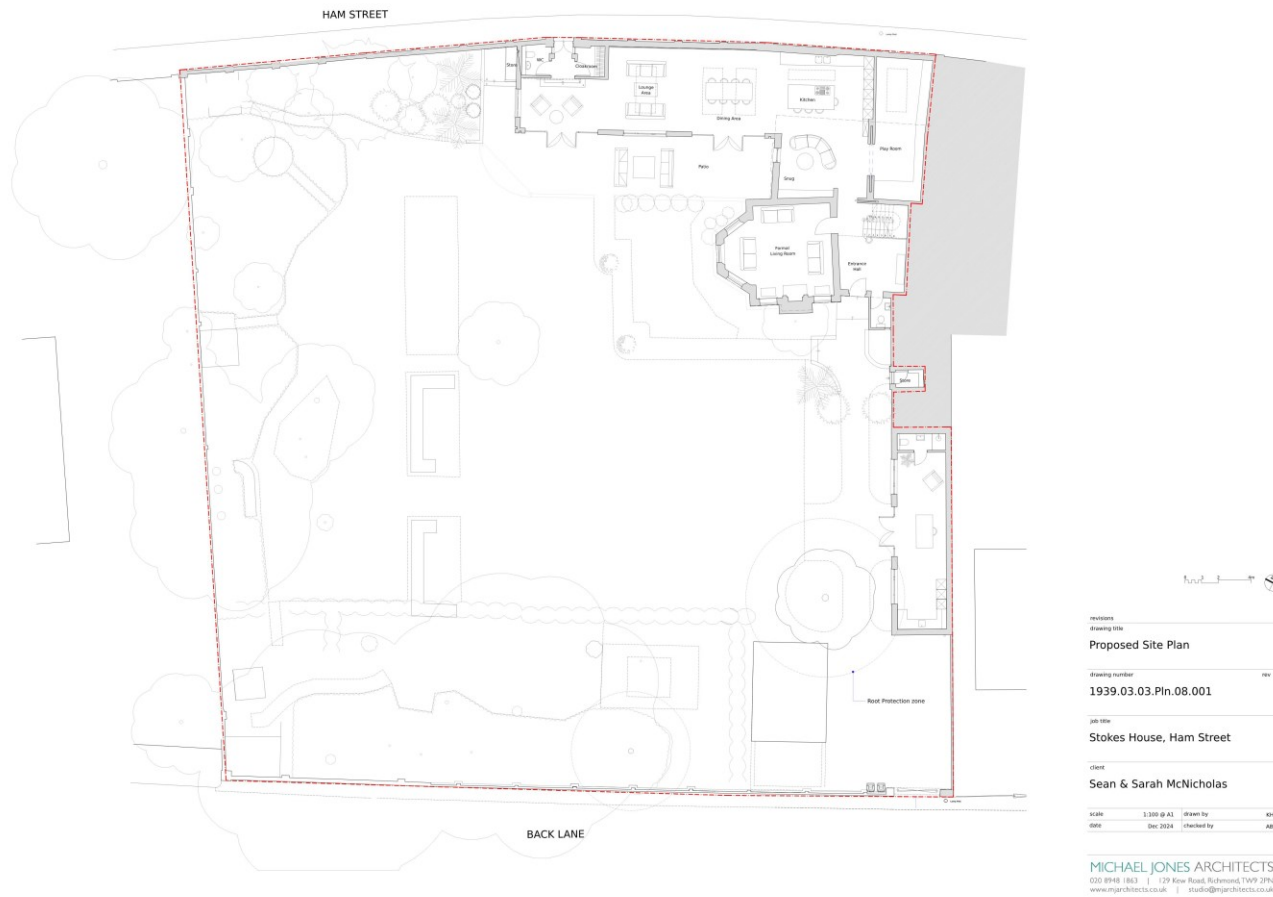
Proposed site plan (reproduced courtesy of the client).
